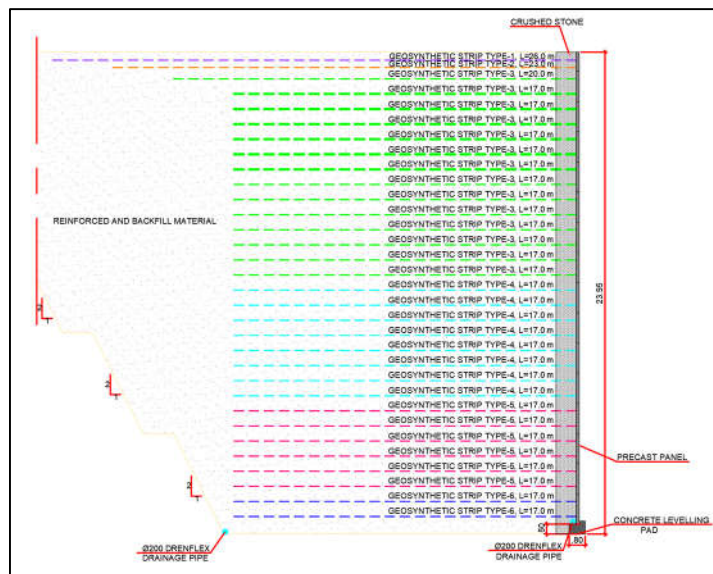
Typical cross section of MSE wall (dimensions are in meters)
